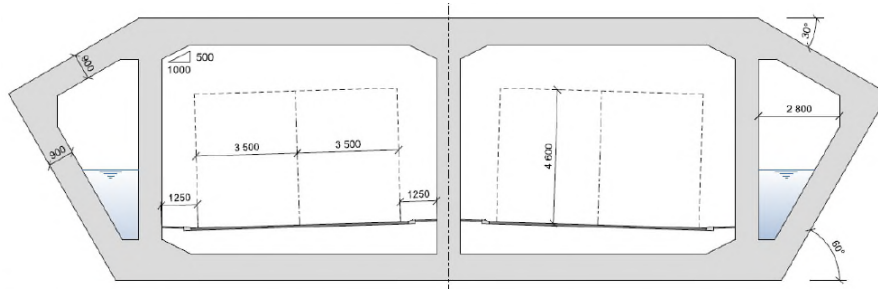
The cross section of the tunnel (Reinertsen, 2014).
